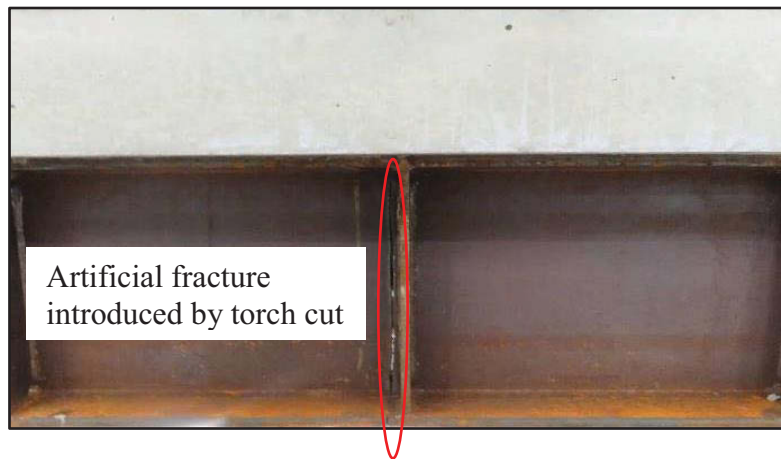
Artificial fracture imposed on the Specimen-2 (by torch cut)
